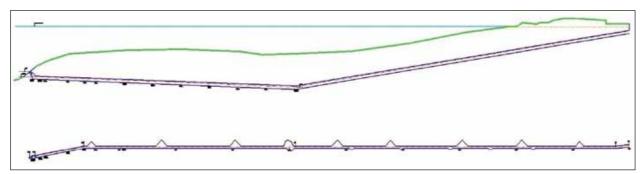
Intake Tunnel layout with niches (Illustration: Norconsult)
